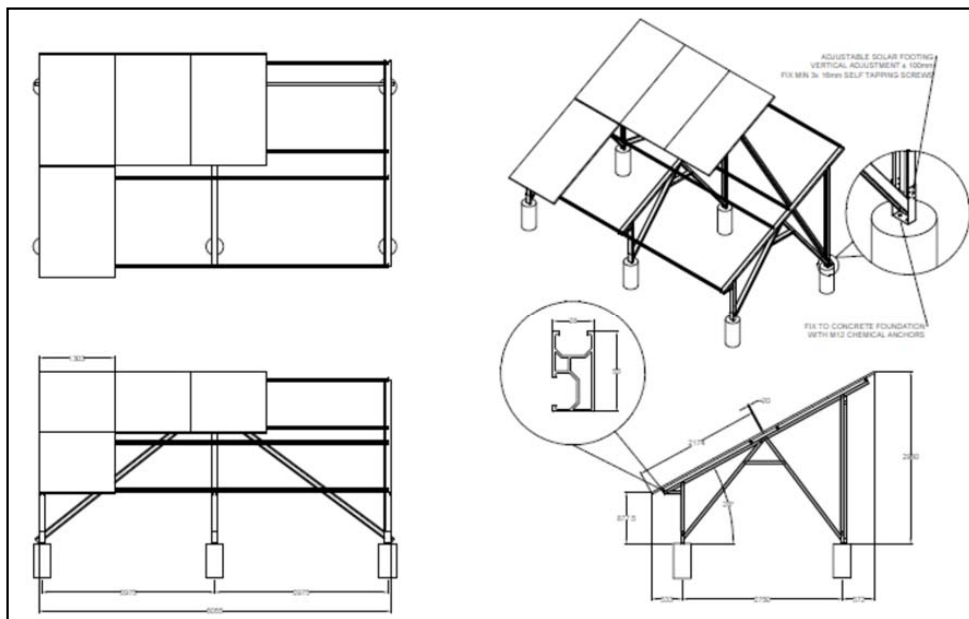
Typical PV Mounting structure (Source: Element Consulting Engineers)
